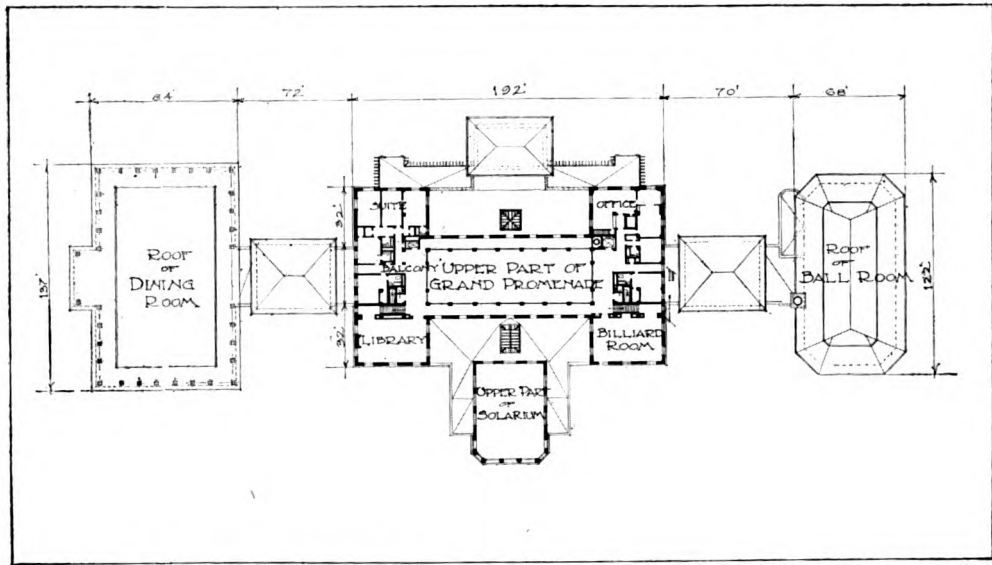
PLAN OF MEZZANINE FLOOR—SOUTH SHORE COUNTRY CLUB, CHICAGO.
